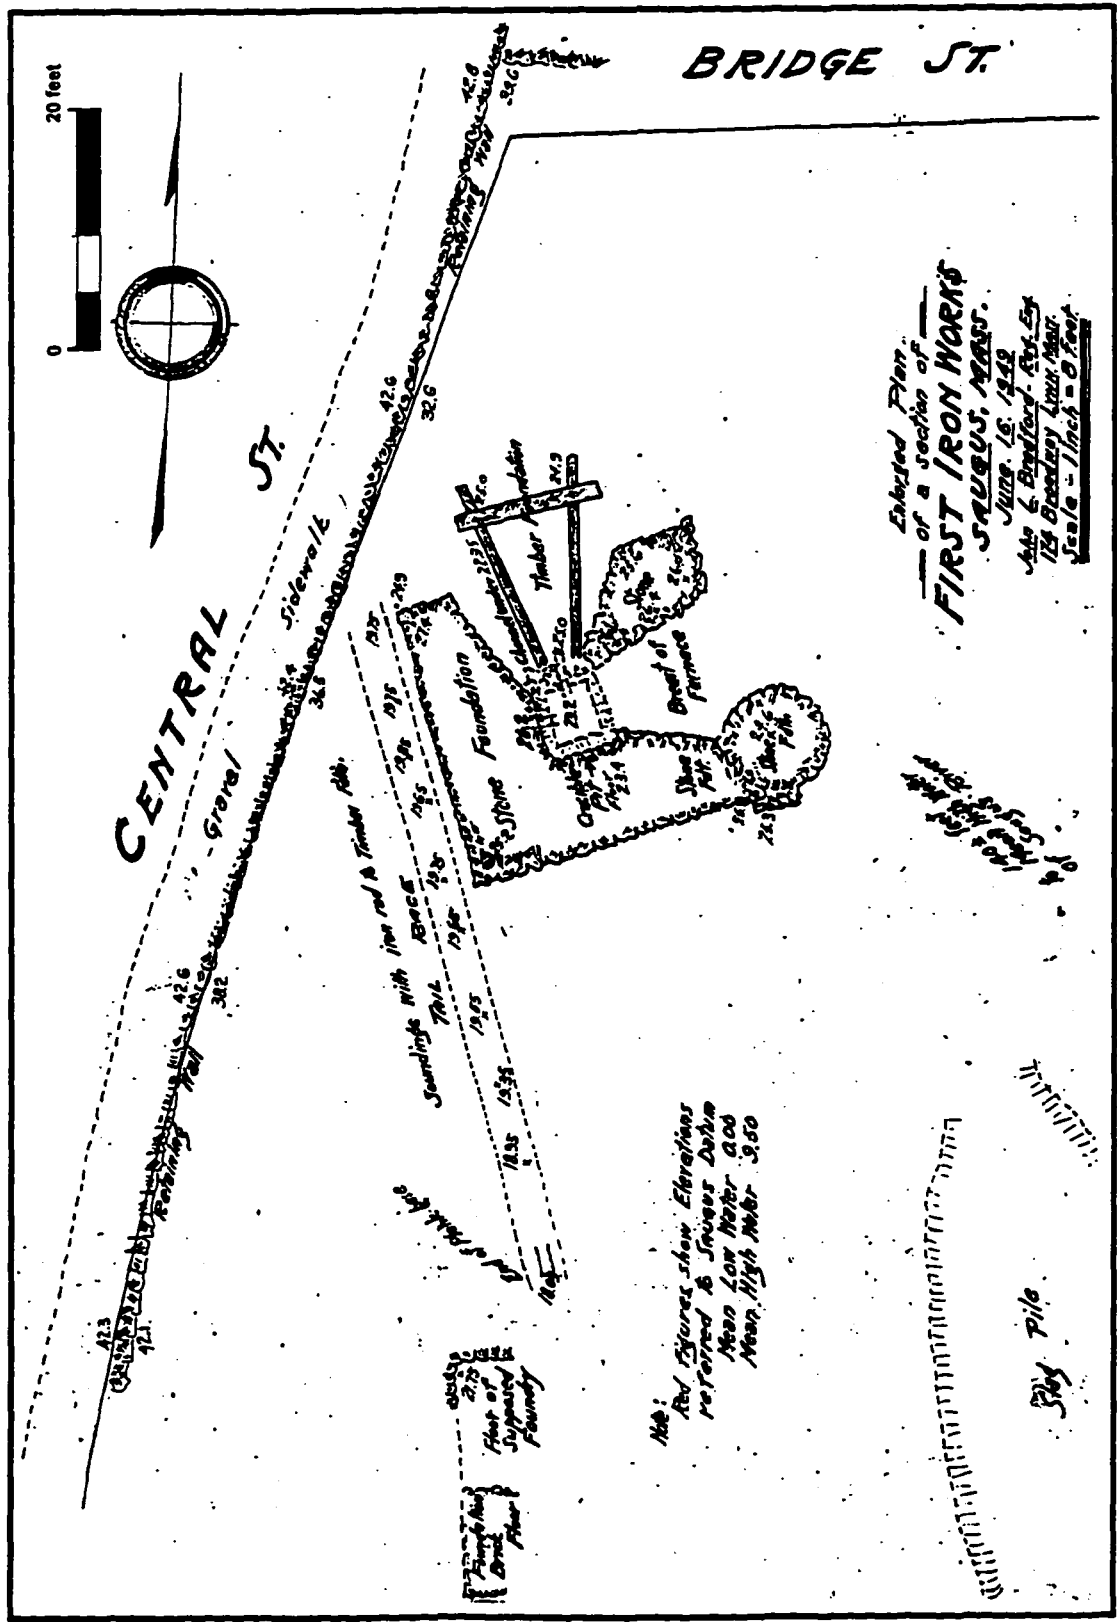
Enlarged plan of a section of First Iron Works, June 16, 1948, drawn by John L. Bradford.
